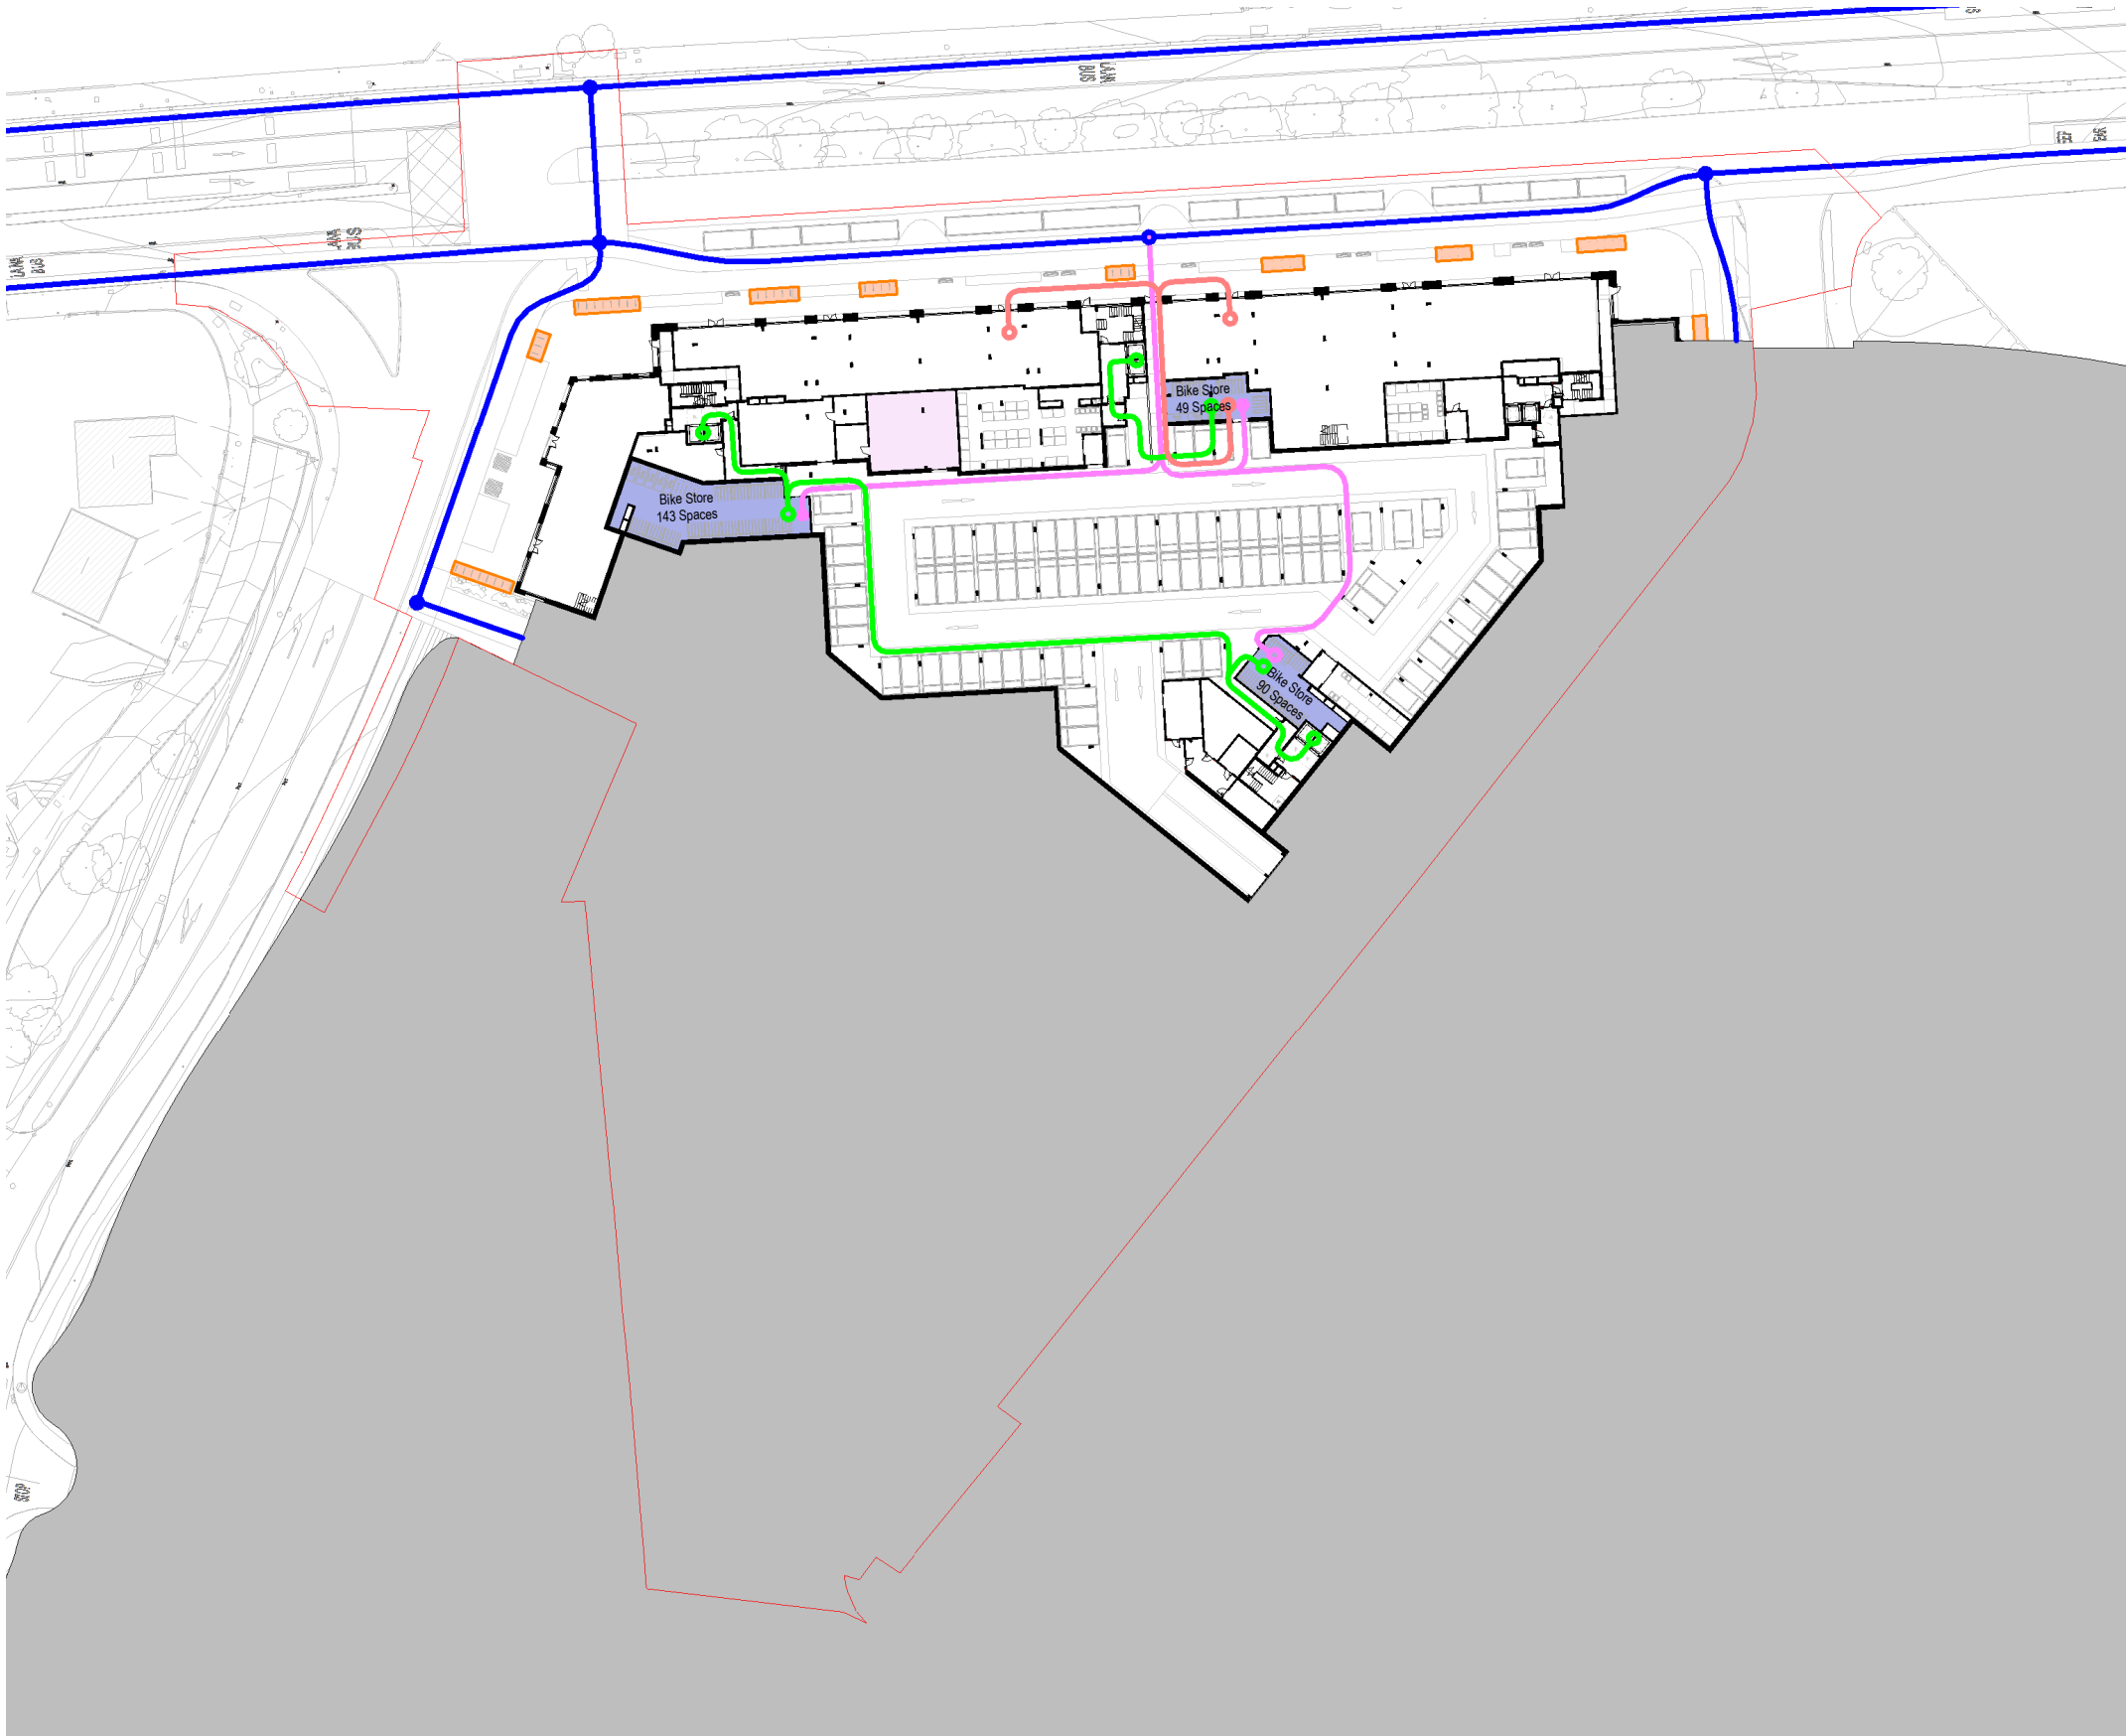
Basement Floor Plan showing bicycle parking areas.
